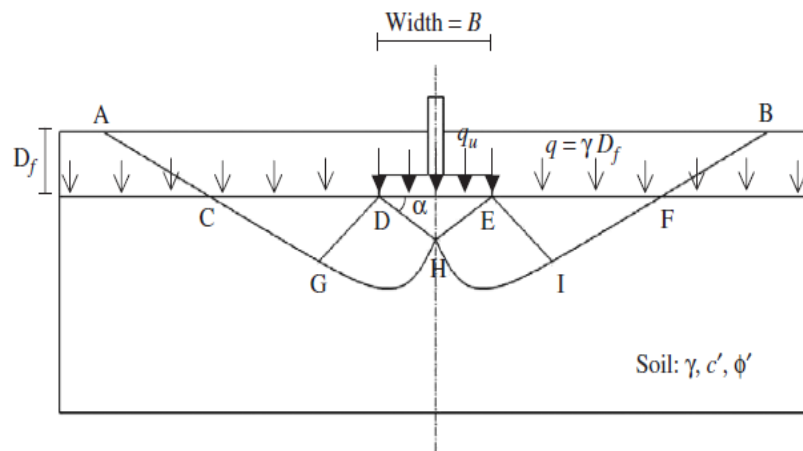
General shear failure of a strip foundation: Terzaghi's assumptions, from [Terzaghi \(1951\)](#).
